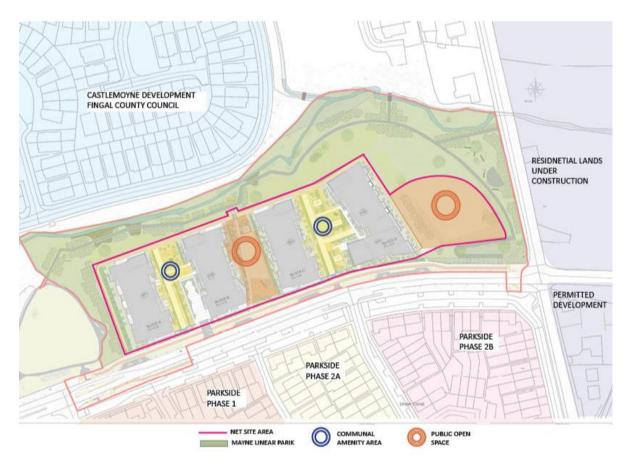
MCORM drawing indicating relationship between the proposed development and the site under construction on the opposite side of Balgriffin Park/ Marrsfield corner site
